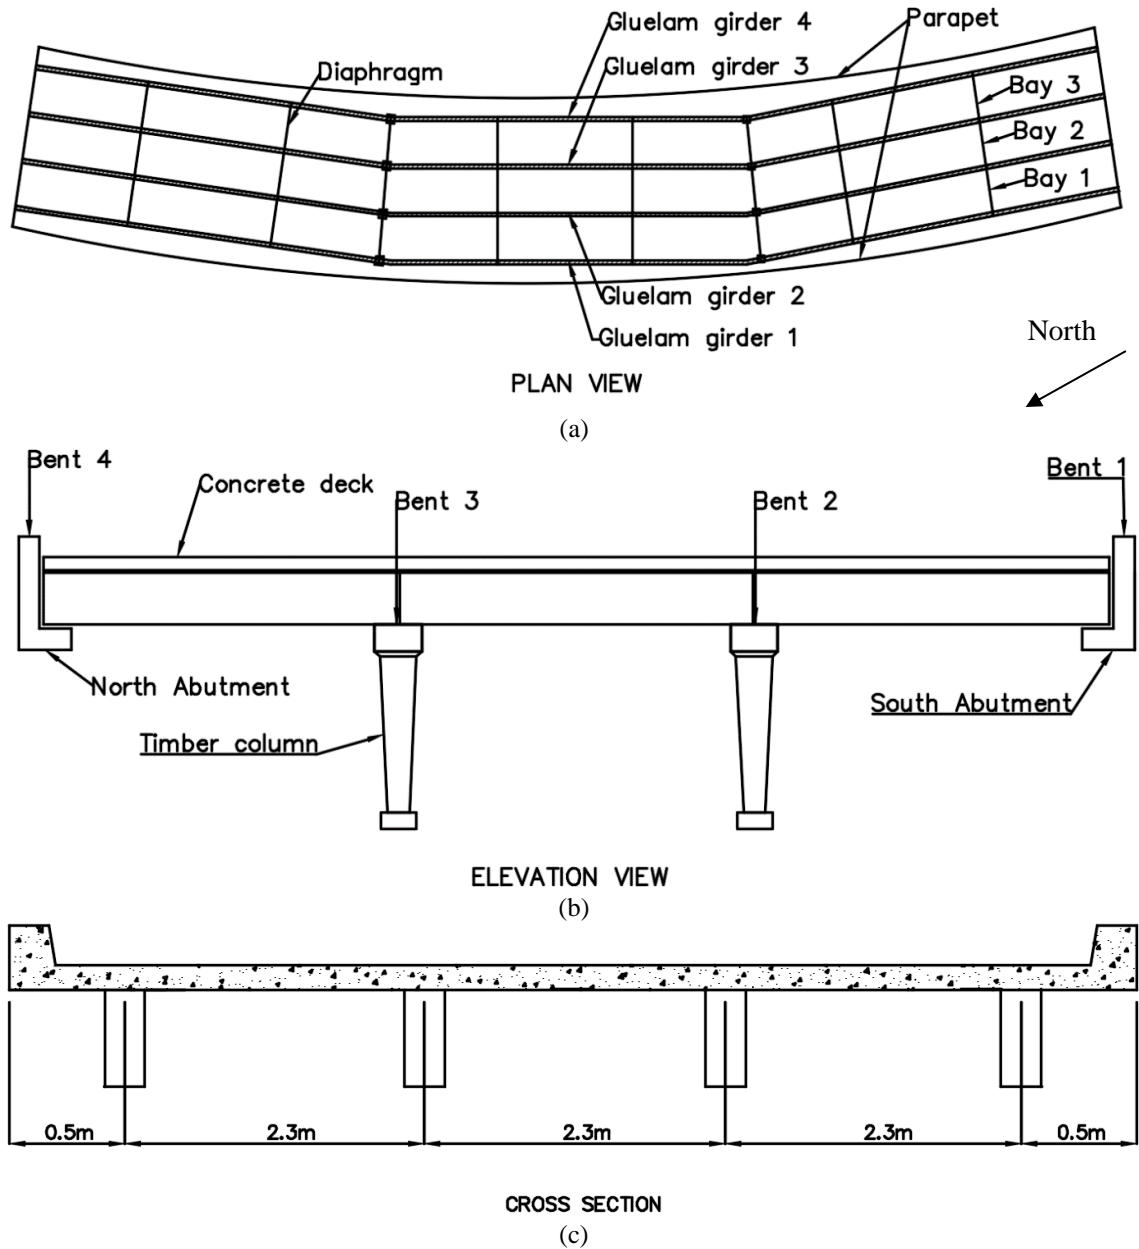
Glulam timber girder bridge components numbering: (a) component numbering on plan view; (b) component numbering on elevation view; and (c) cross-section view.
